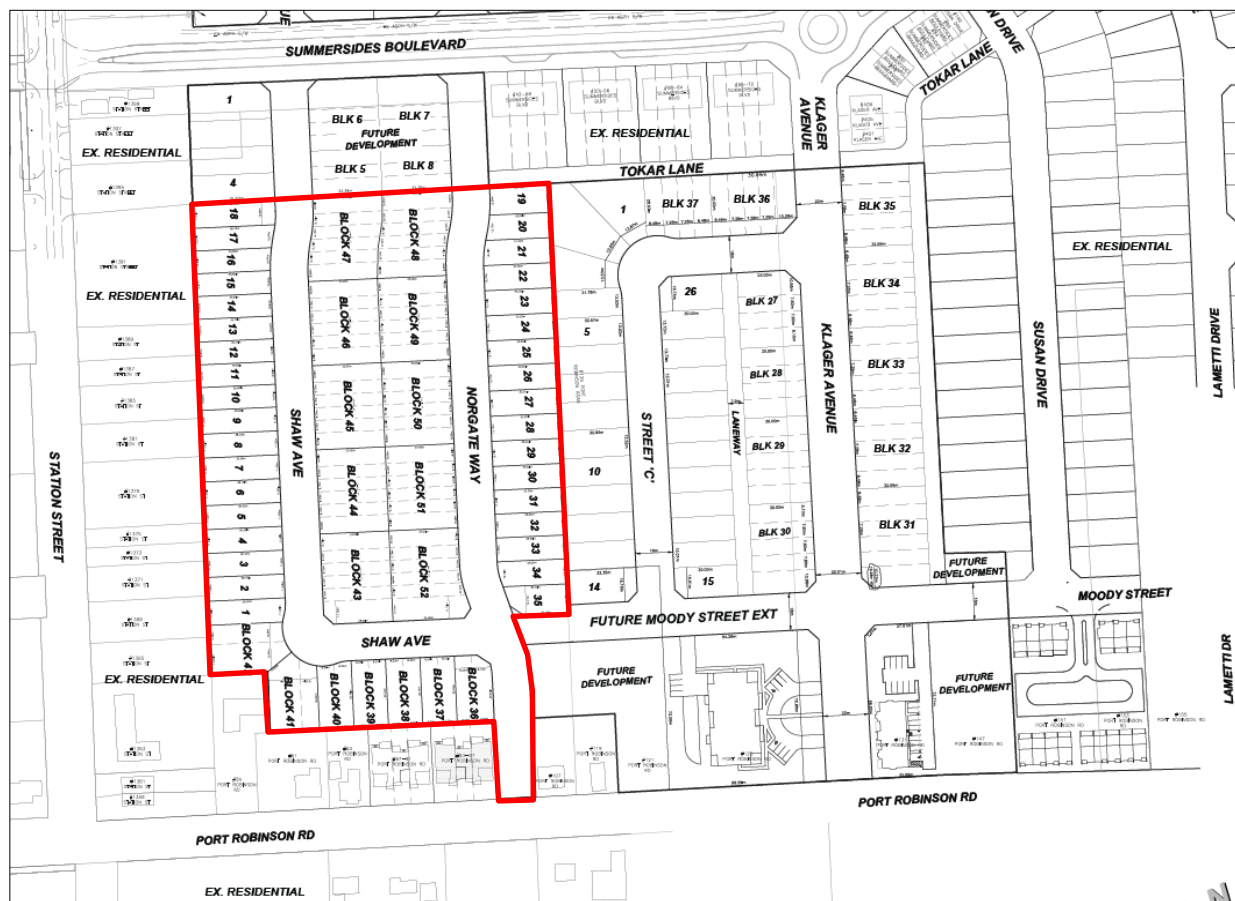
below illustrates the initial Draft Plan of Subdivision that received approval on May 16, 2022. The original draft plan consisted of seventy (70) lots for single detached dwellings. Official Plan Amendment and Zoning By-law Amendments were passed on June 20th, 2022 supporting the subdivision design.
